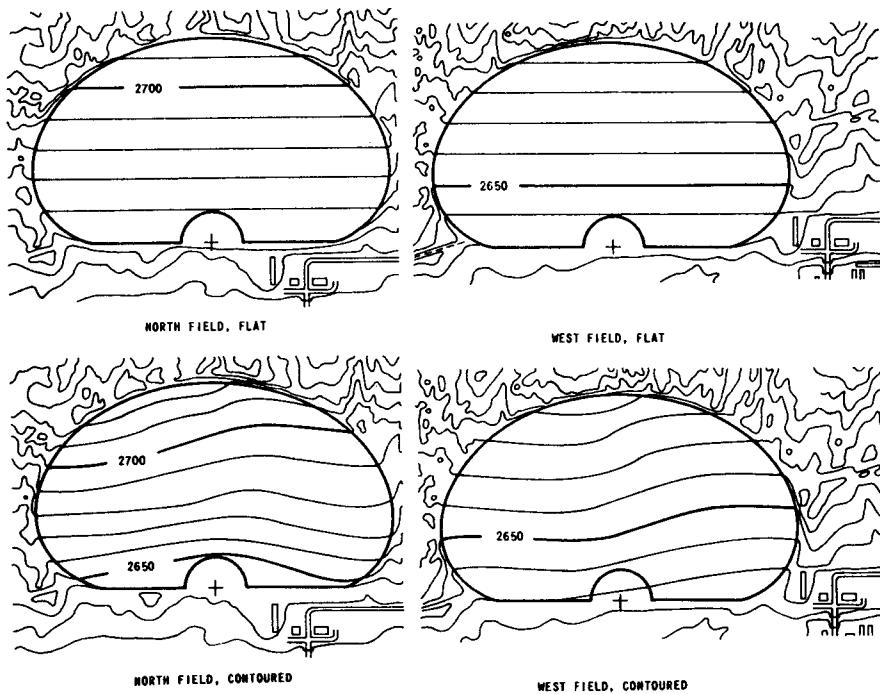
ALTERNATE SITE GRADING PLANS
